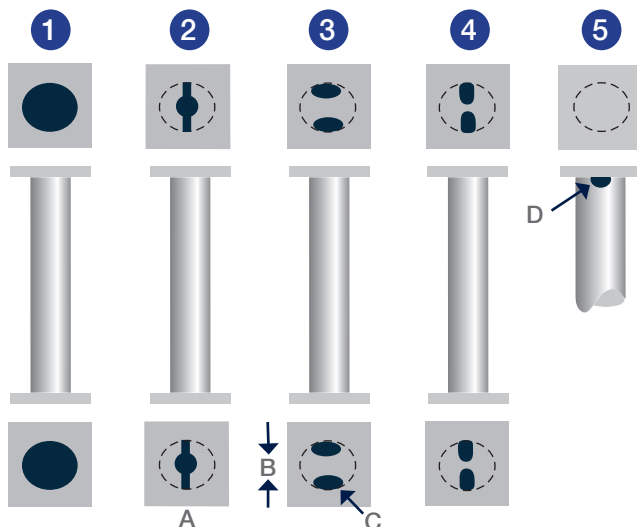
Pipe columns, pipe girders, street light poles, and transmission poles
